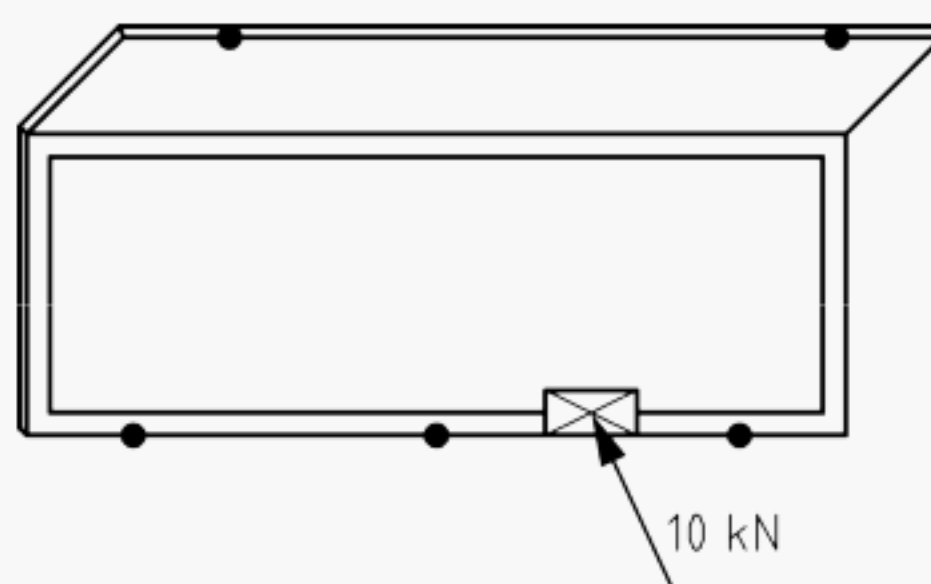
Sliding walls over 5 m < 7 m long
